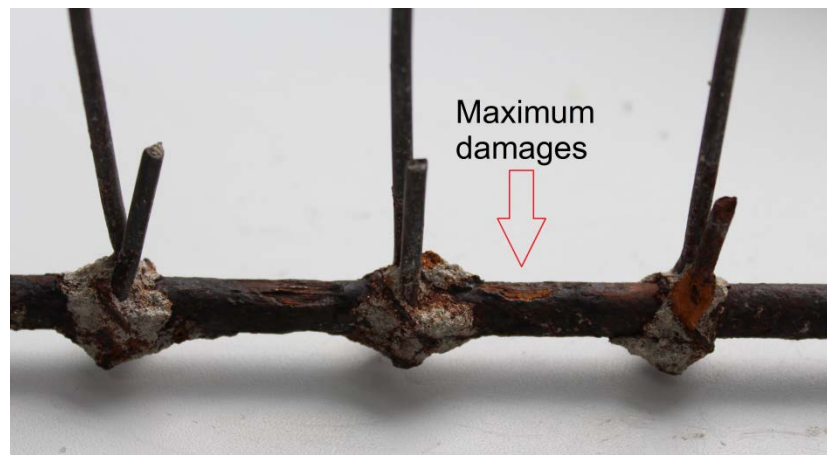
Steel reinforcement corrosion type damages of reinforced concrete beams.
